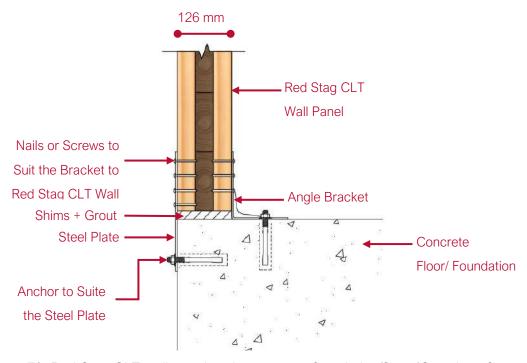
Red Stag CLT wall panel to the concrete foundation/floor (On edge of external walls of the building).
